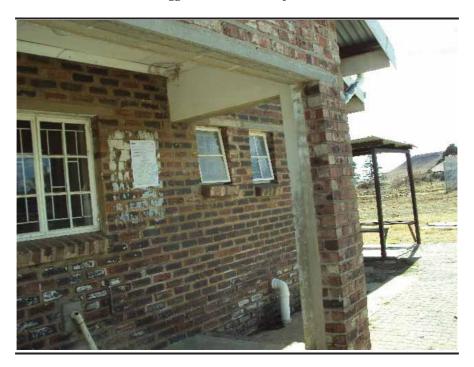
Site Notice Placement - Dirkiesdorp Clinic
